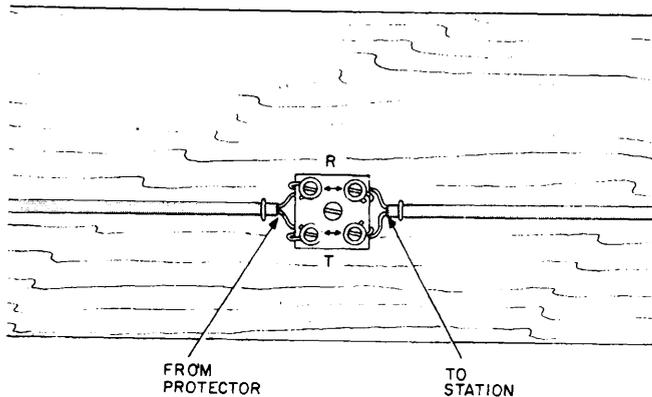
WECo Number 11A Connecting Block Used to Extend Station Wiring.
